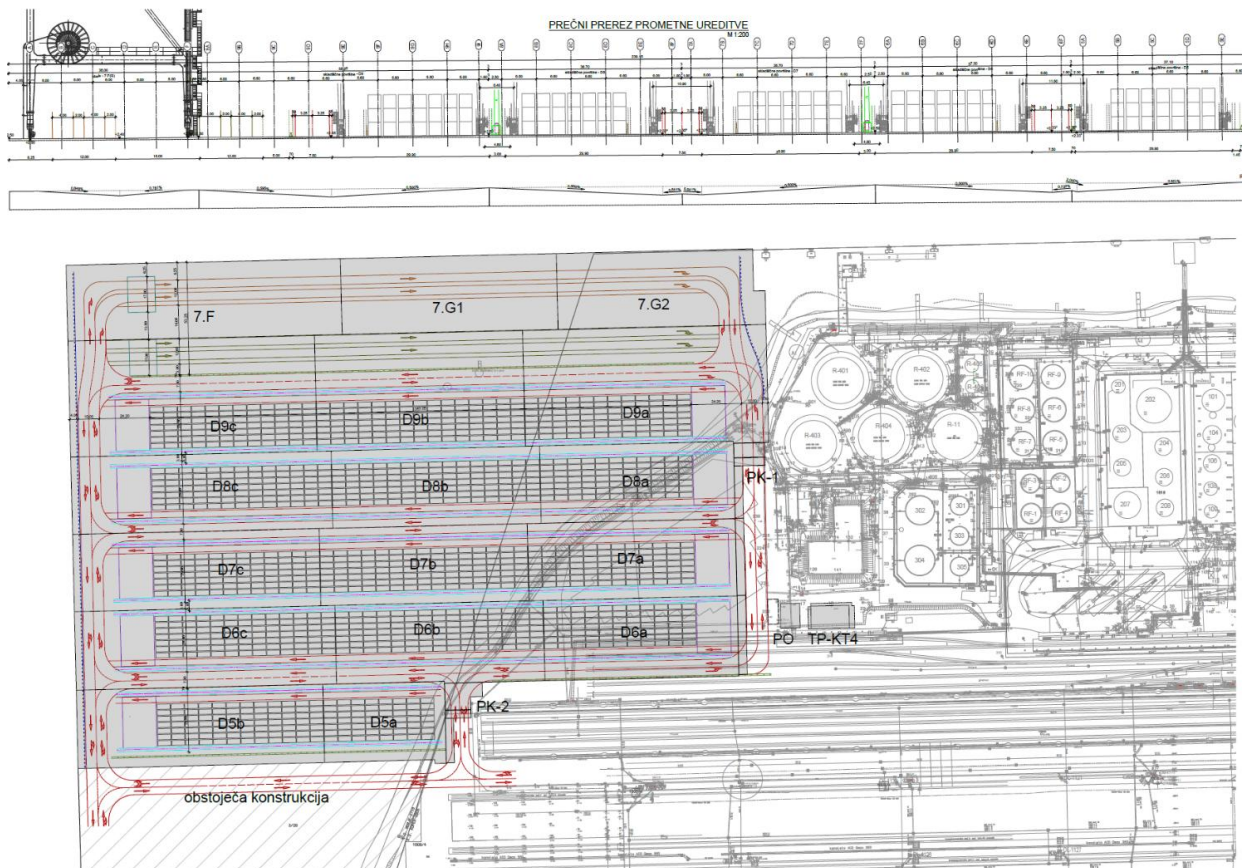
Cross-section and layout of the traffic arrangement for the northern part of Pier I
